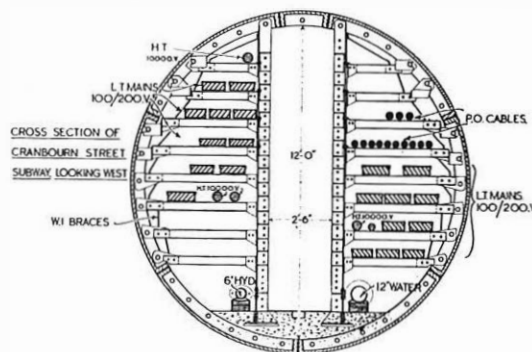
CROSS SECTION OF NEW SUBWAY AT CRANBOURN STREET.
